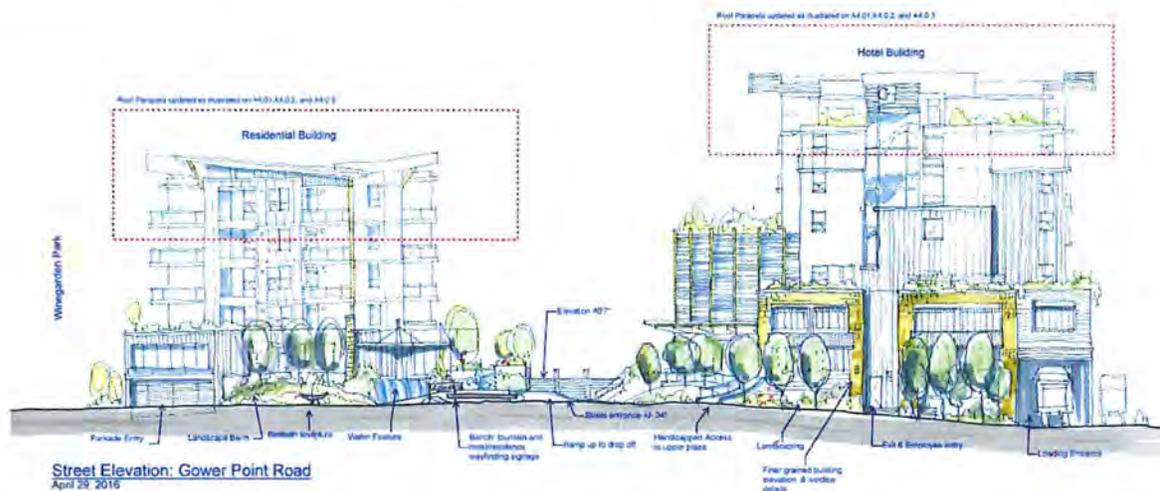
Gower Point Road streetscape (drawing A9.0.3a)
